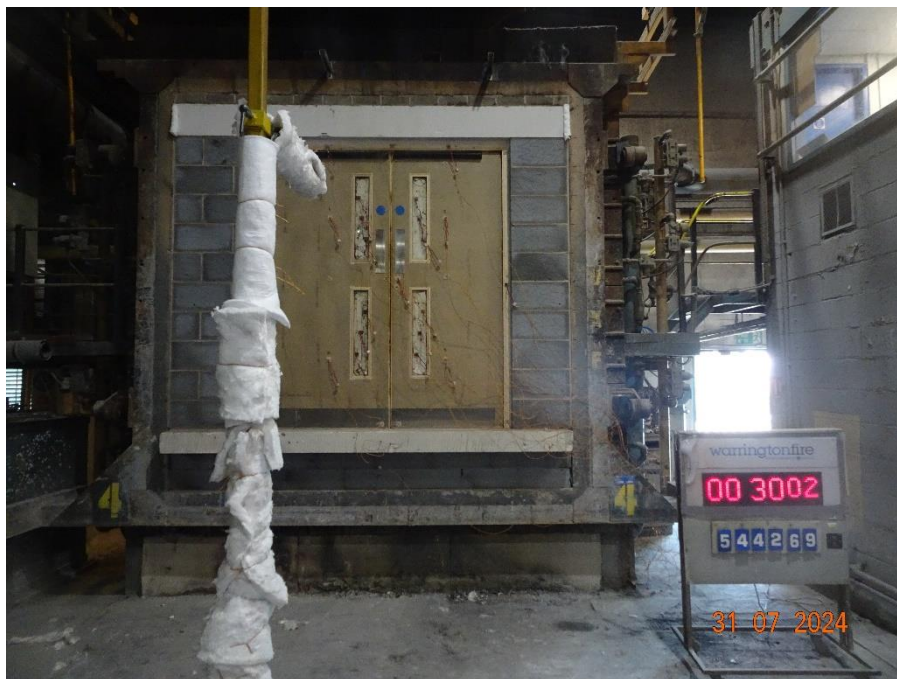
Unexposed face of the specimen at 30 minutes of testing
